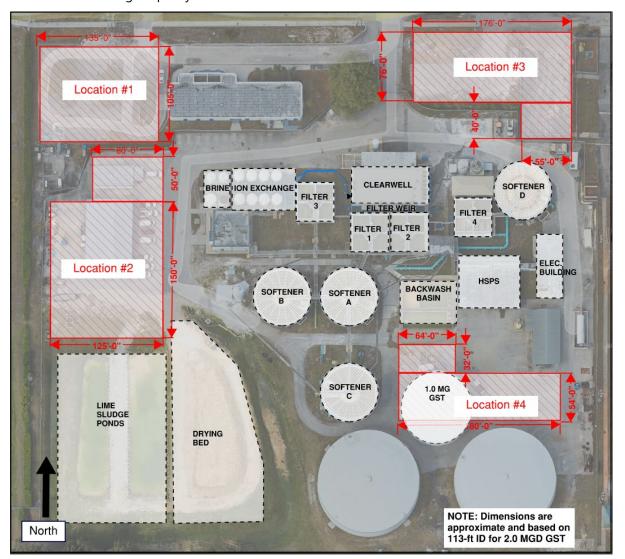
Potential Siting Options Within the WTP That Were Considered During Conceptual Design for the Proposed PFAS Treatment Facility
